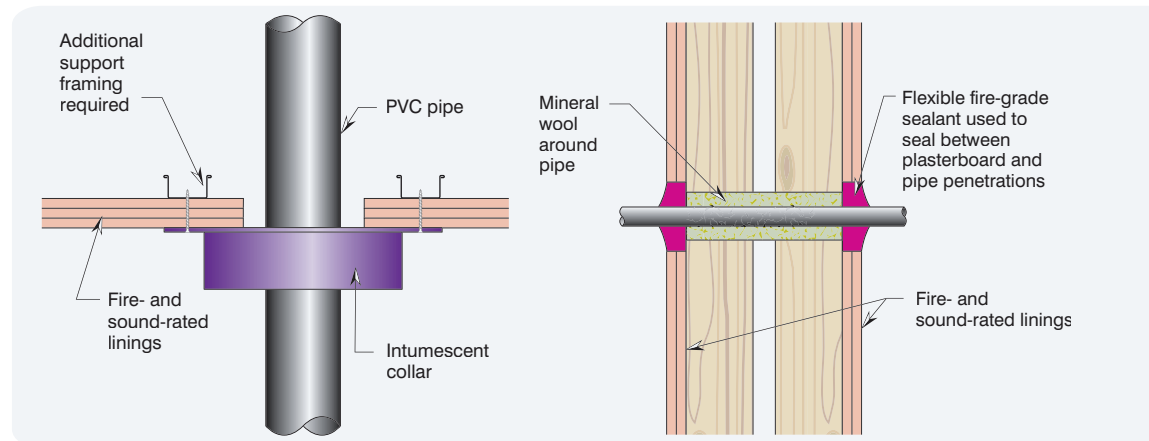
Plumbing service penetration in fire- and sound-rated wall and floor/ceiling – elevation view.
